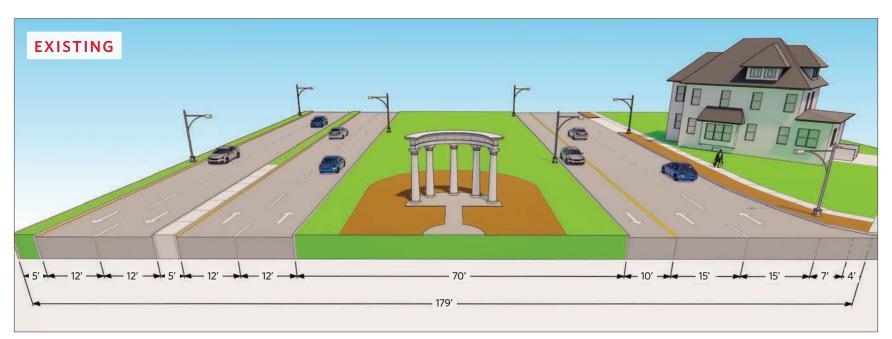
Existing Street Section for W. Michigan Avenue between South and Lovell Streets, Looking Northeast There are two travel paths where only one is needed.
